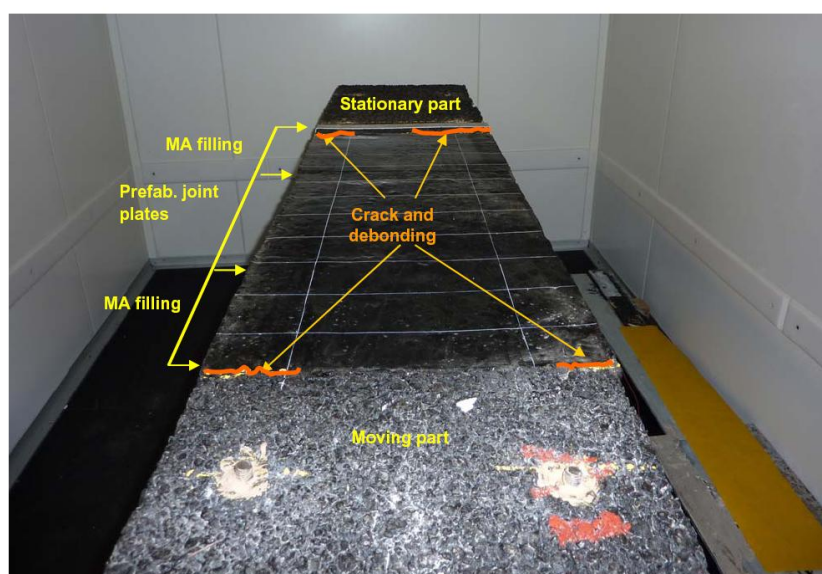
KLK Joint, 1st specimen A1. Crack and debonding of the mastic asphalt MA from the bridge pavement which occurred during the first cycle
